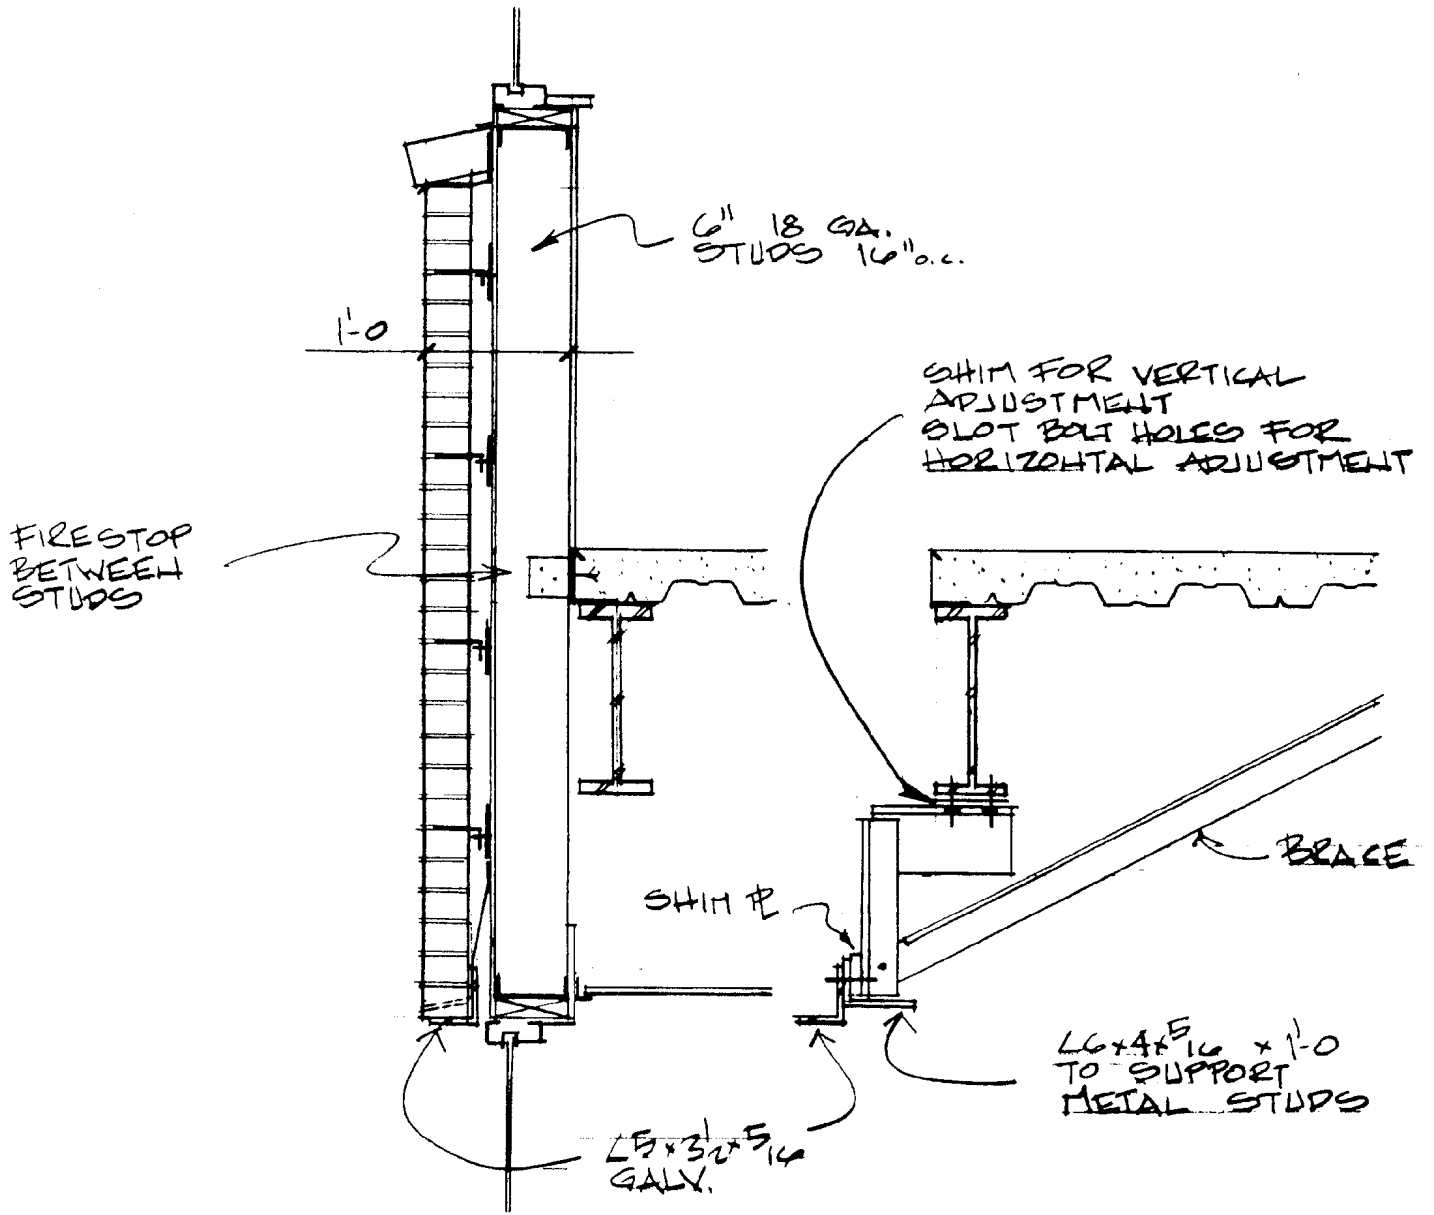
veneer wall with metal stud back-up at continuous windows. Structural steel hung lintel detail shown at right.
